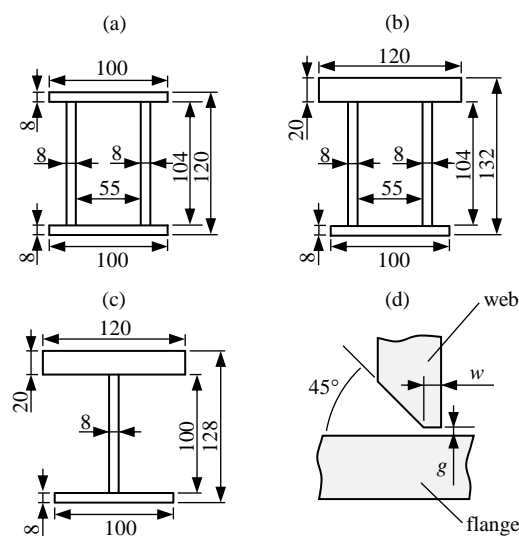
Cross-section shape and dimensions of the box section specimens (a) FF1-FF3 and (b) FF4-FF8, and (c) the I section specimens for the experimental fatigue tests; (d) groove dimensions (w is the width of root face and g is the air gap).
